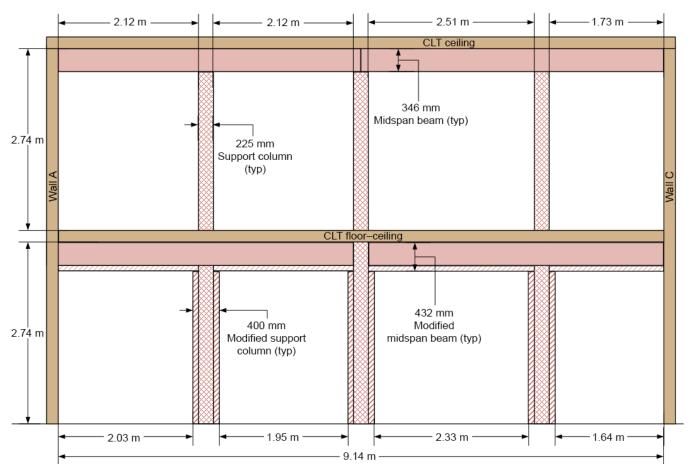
Cross-sectional view of apartment showing locations of support columns.
